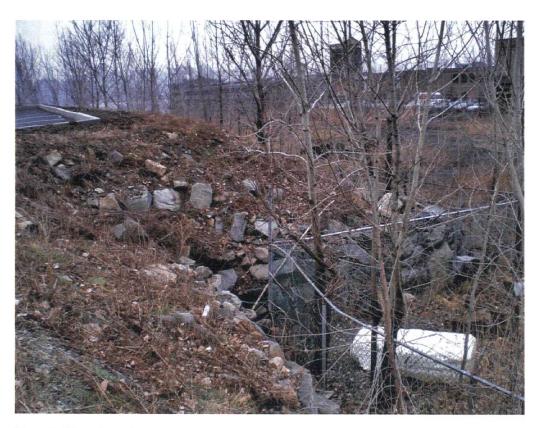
Elevation of eastern parking lot area built up on fill/rip-rap, looking west.
